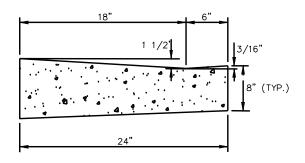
DETAIL FOR COMPUTING ROUND STRUCTURE ELEVATIONS SCALE: NONE
